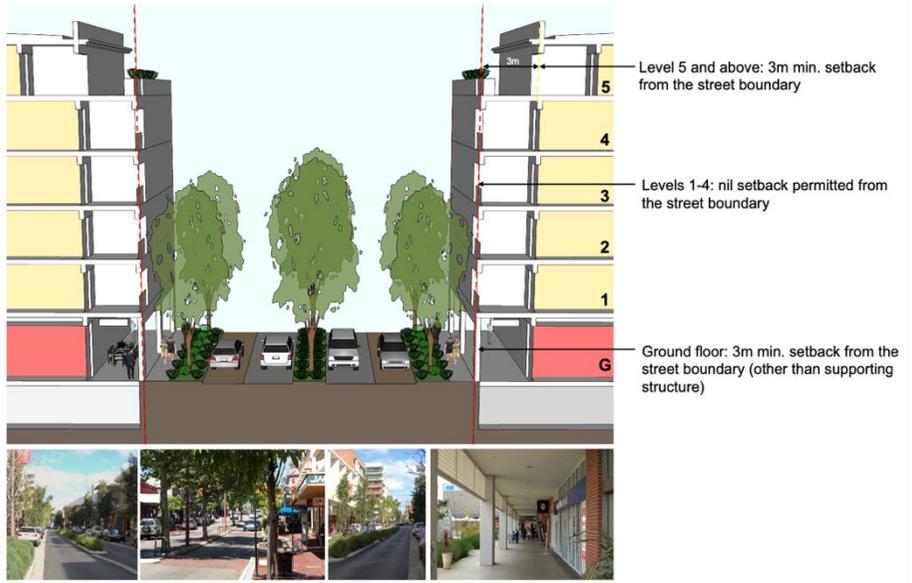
Street Type 1 – Major Retail Street (Cambridge Street West)
